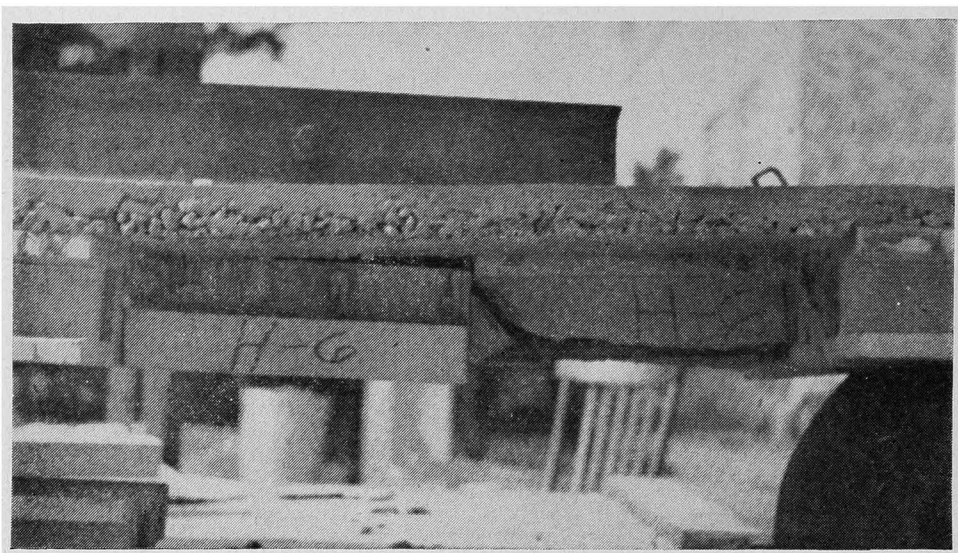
(a). Typical condition of the beam tile in the beams made from Tile A, which was a high strength tile. Note that plane failure follows along top of beam tile, indicating that with the stronger tile the bond between the tile and the concrete and the shear strength were about the same.
